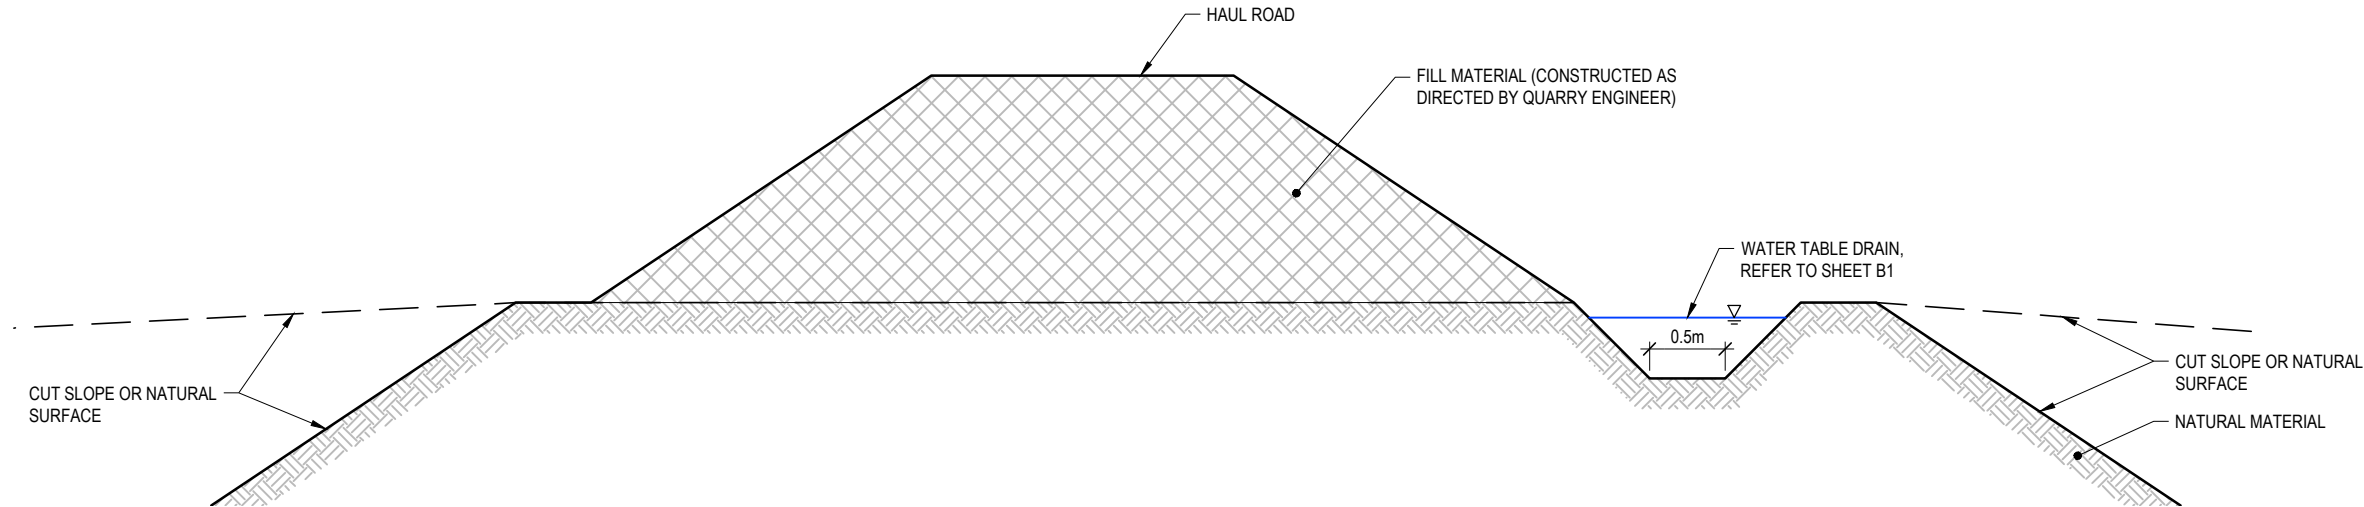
HAUL ROAD FILL AND CHANNEL DETAIL
